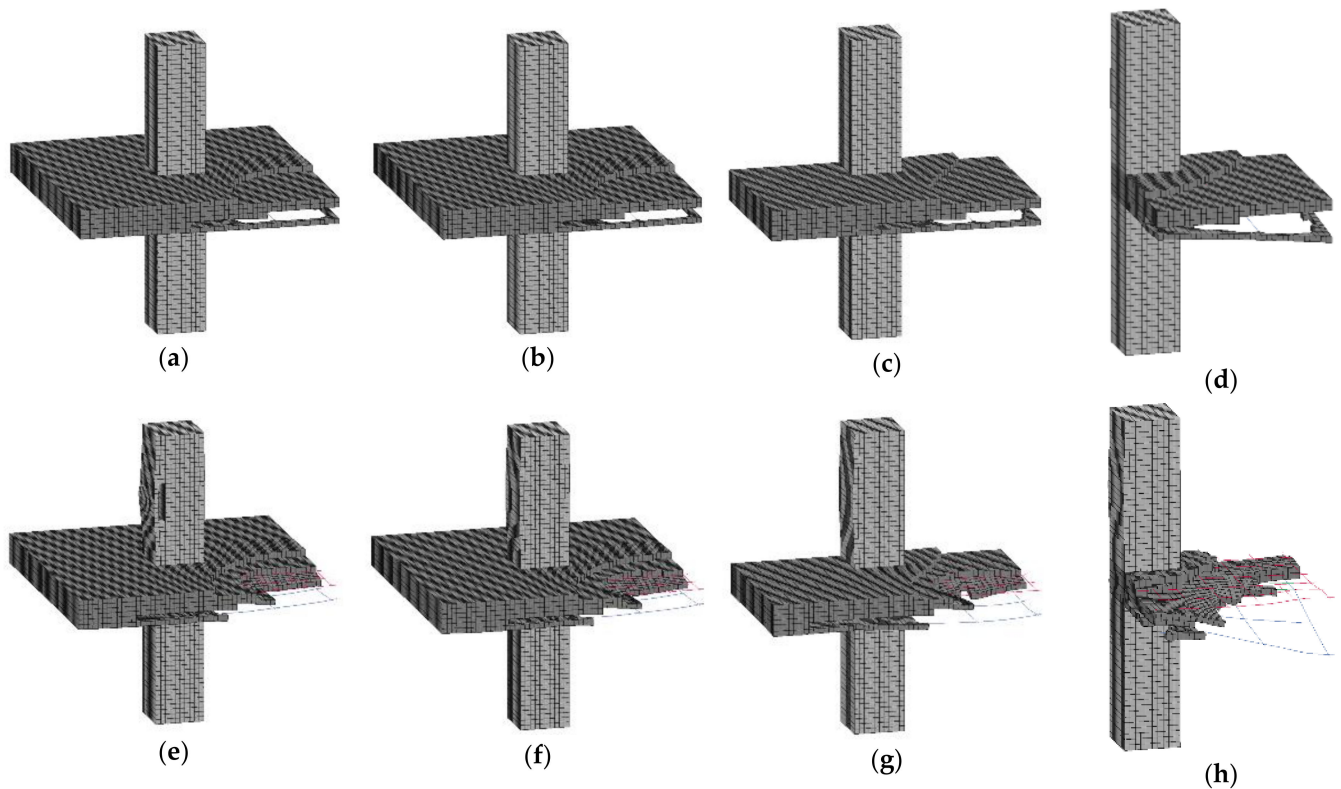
Failure shape of slab–column connections: (a) specimen IC4; (b) specimen IC-D4; (c) specimen EC4; (d) specimen CC4; (e) specimen IC12; (f) specimen IC-D12; (g) specimen EC12; (h) specimen CC12.
